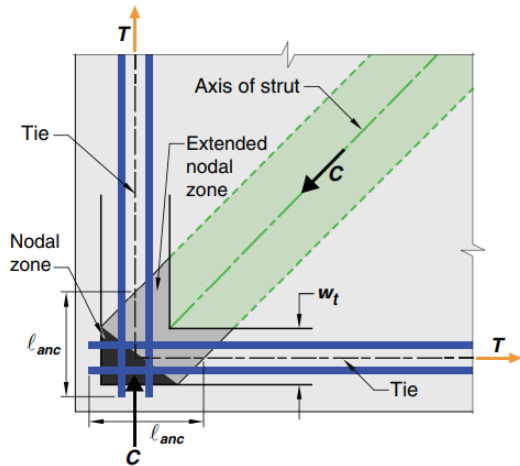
Extended nodal zone anchoring two ties.
